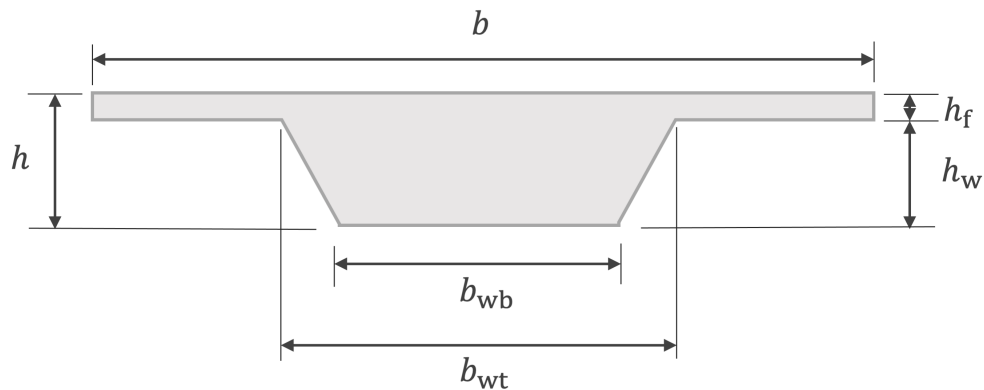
Cross-section geometry for T-section with tapered web and extended slab.
